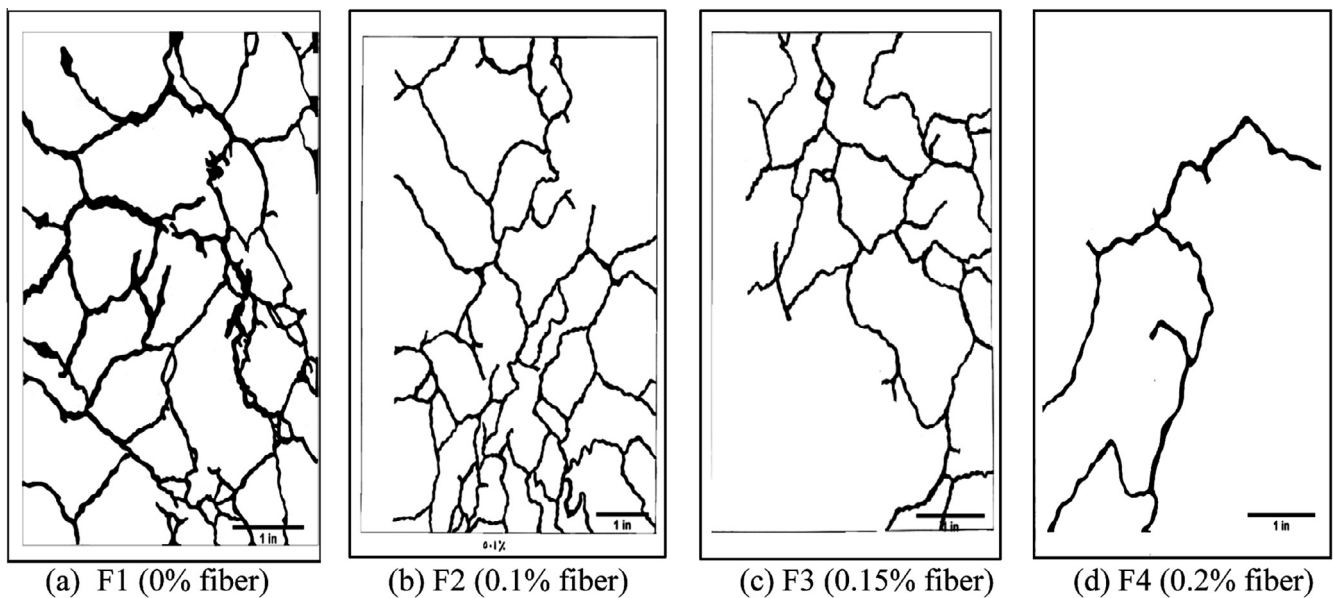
Shrinkage crack in concrete slabs 150×90 mm (drawn in tracing paper from printed image).
